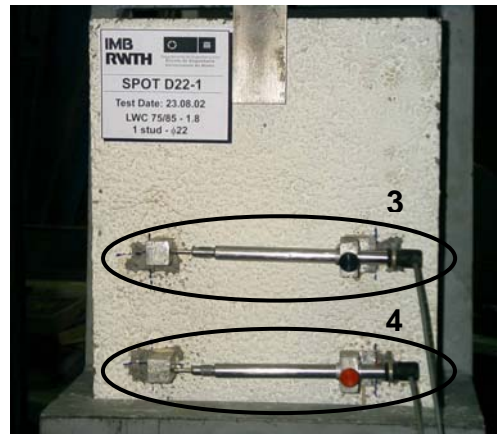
Details of strain gauges dispositions (POST tests)
